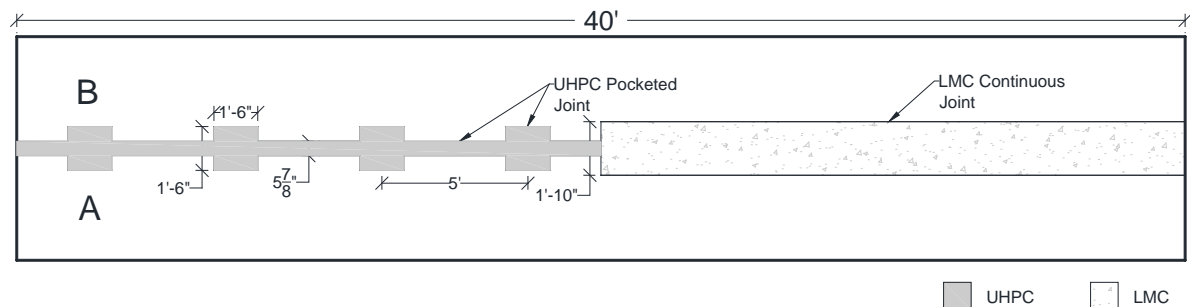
Proposed Rehabilitation for Double-Tee Bridge Test Specimen—Plan View
